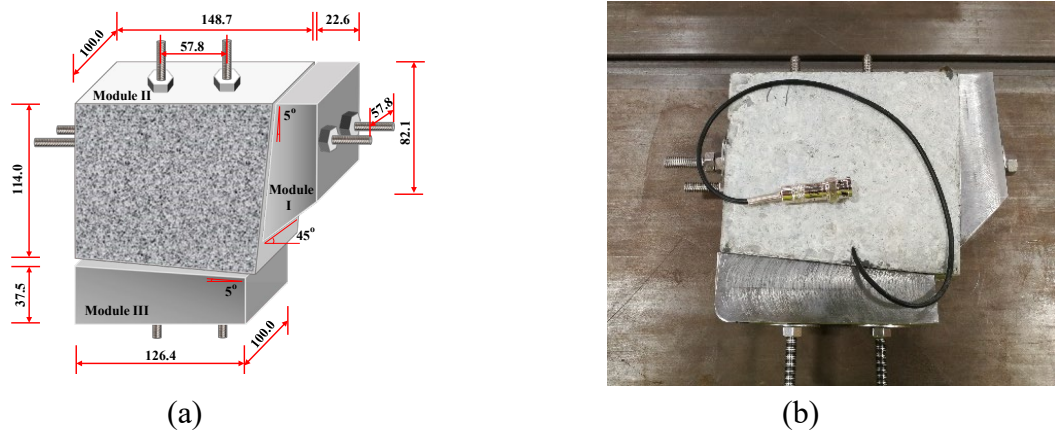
A 1/5-scale SMART shear key: (a) schematic view and dimension (unit: mm) and (b) prototype assembly
